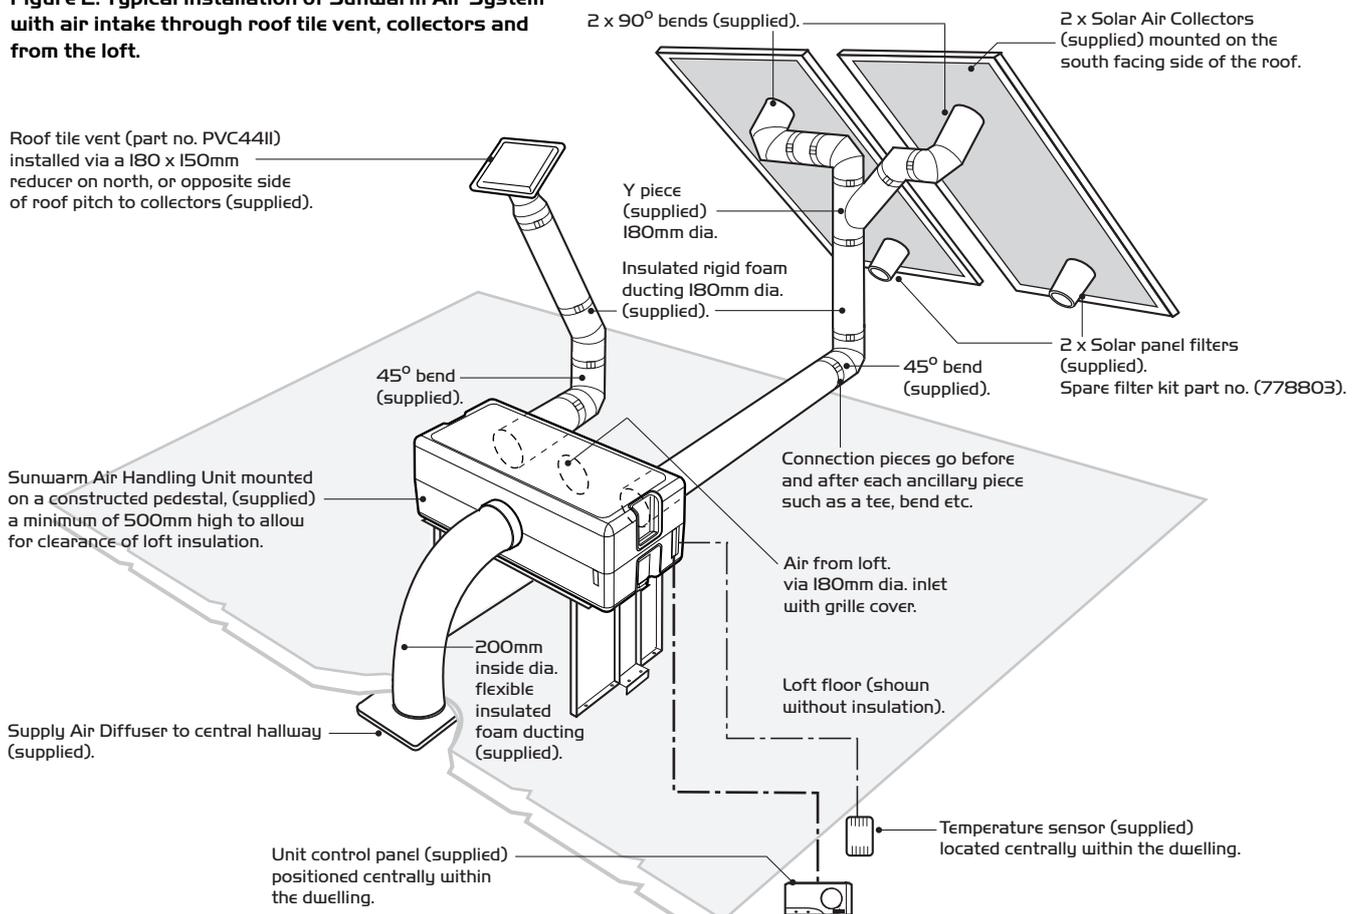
Typical installation of Sunwarm Air System with air intake through roof tile vent, collectors and from the loft.
